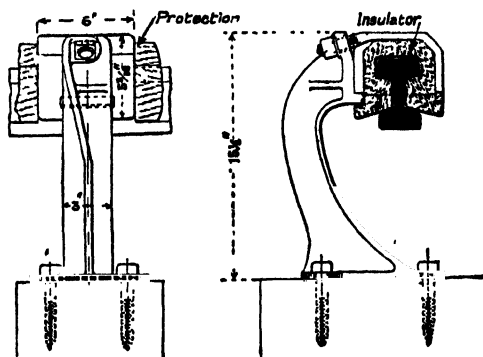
METHOD OF MOUNTING UNDER-CONTACT CONDUCTOR RAILS
